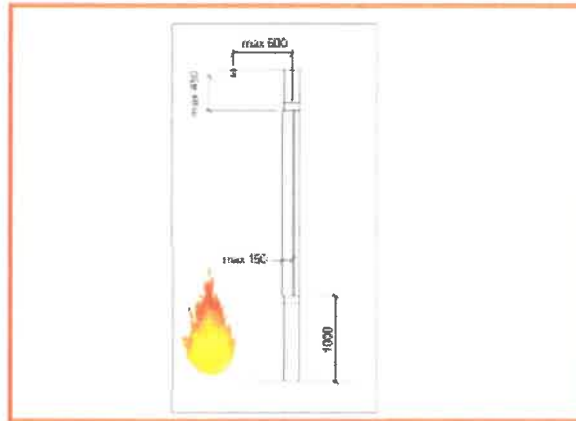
Excerpt from “Fire Protection of Windows Using Sprinklers”, showing limiting distances of ceiling mounted pendant type sprinklers to protect for an Internal Exposure
